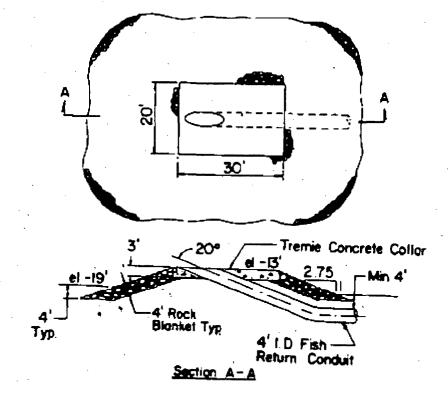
SONGS Fish Return Pipe Discharge – Plan & Section
